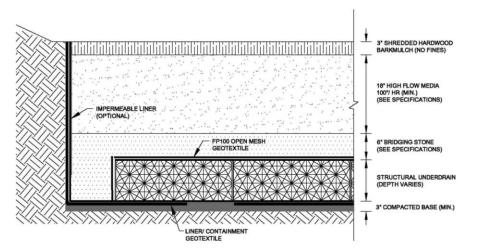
Typical engineered soil cross section (FocalPoint, distributed by Construction EcoServices)
